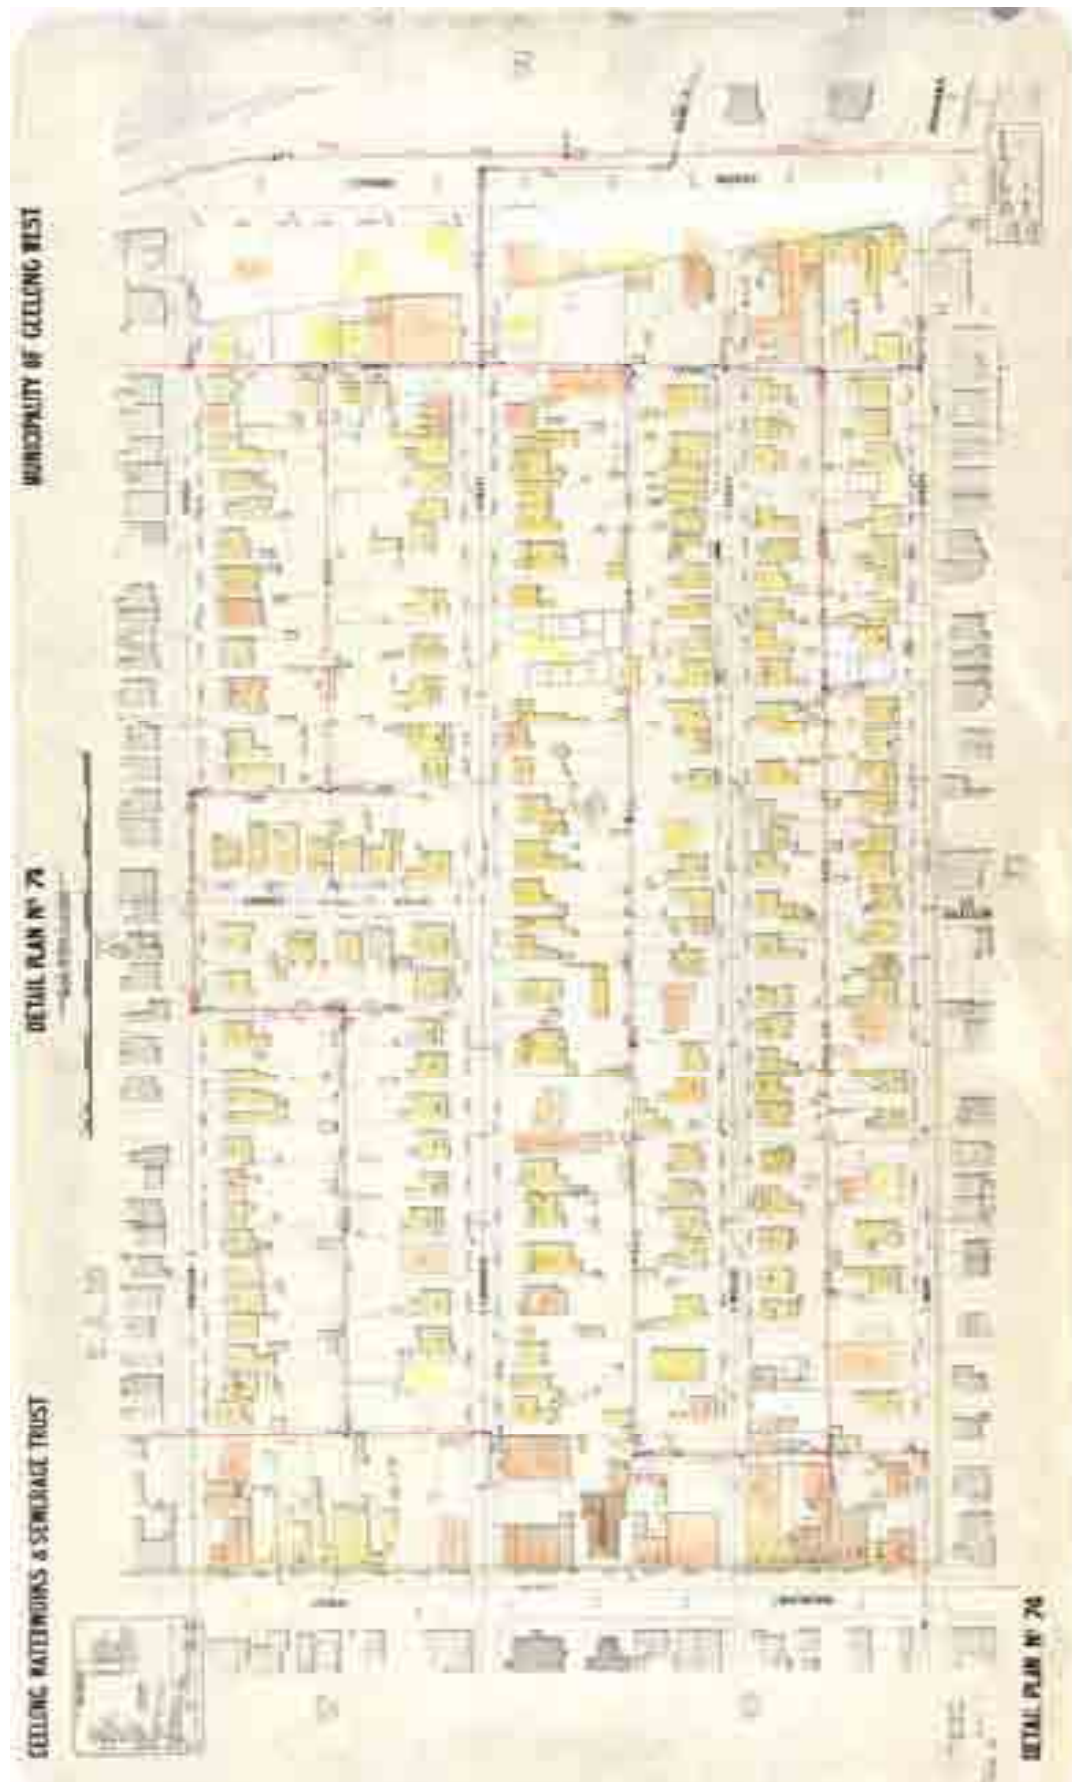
Geelong Waterworks & Sewerage Trust Detail Plan No. 74, 1971. Source: Barwon Water collection.
